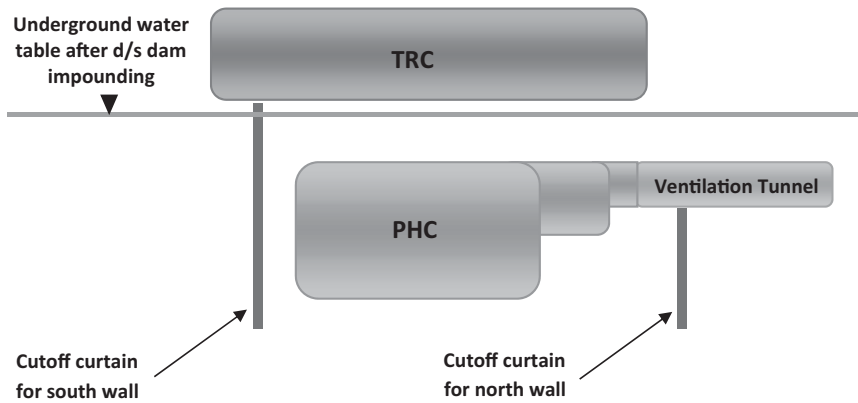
Proposed locations for cutoff curtain in PHC north and south walls (Sharifzadeh et al., 2008).
